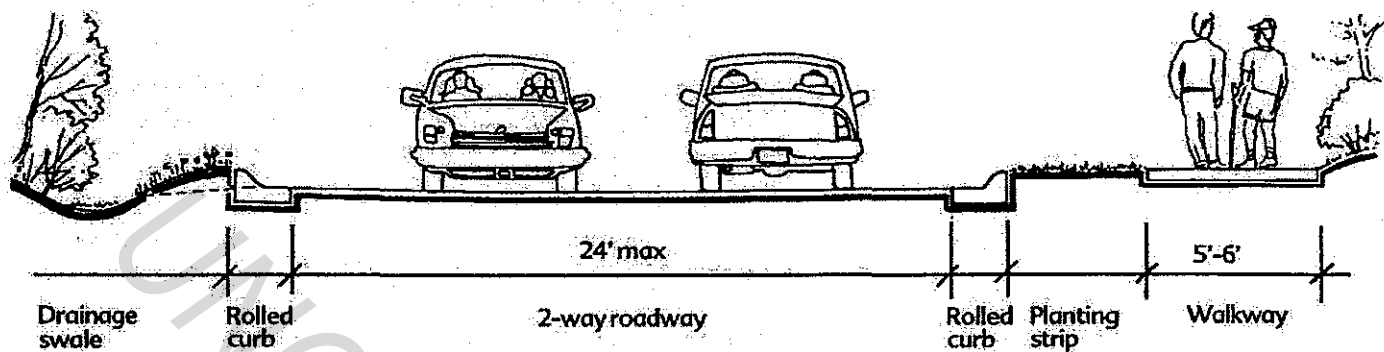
26-foot two-way roadway section with drainage swale and sidewalk (typical condition)
